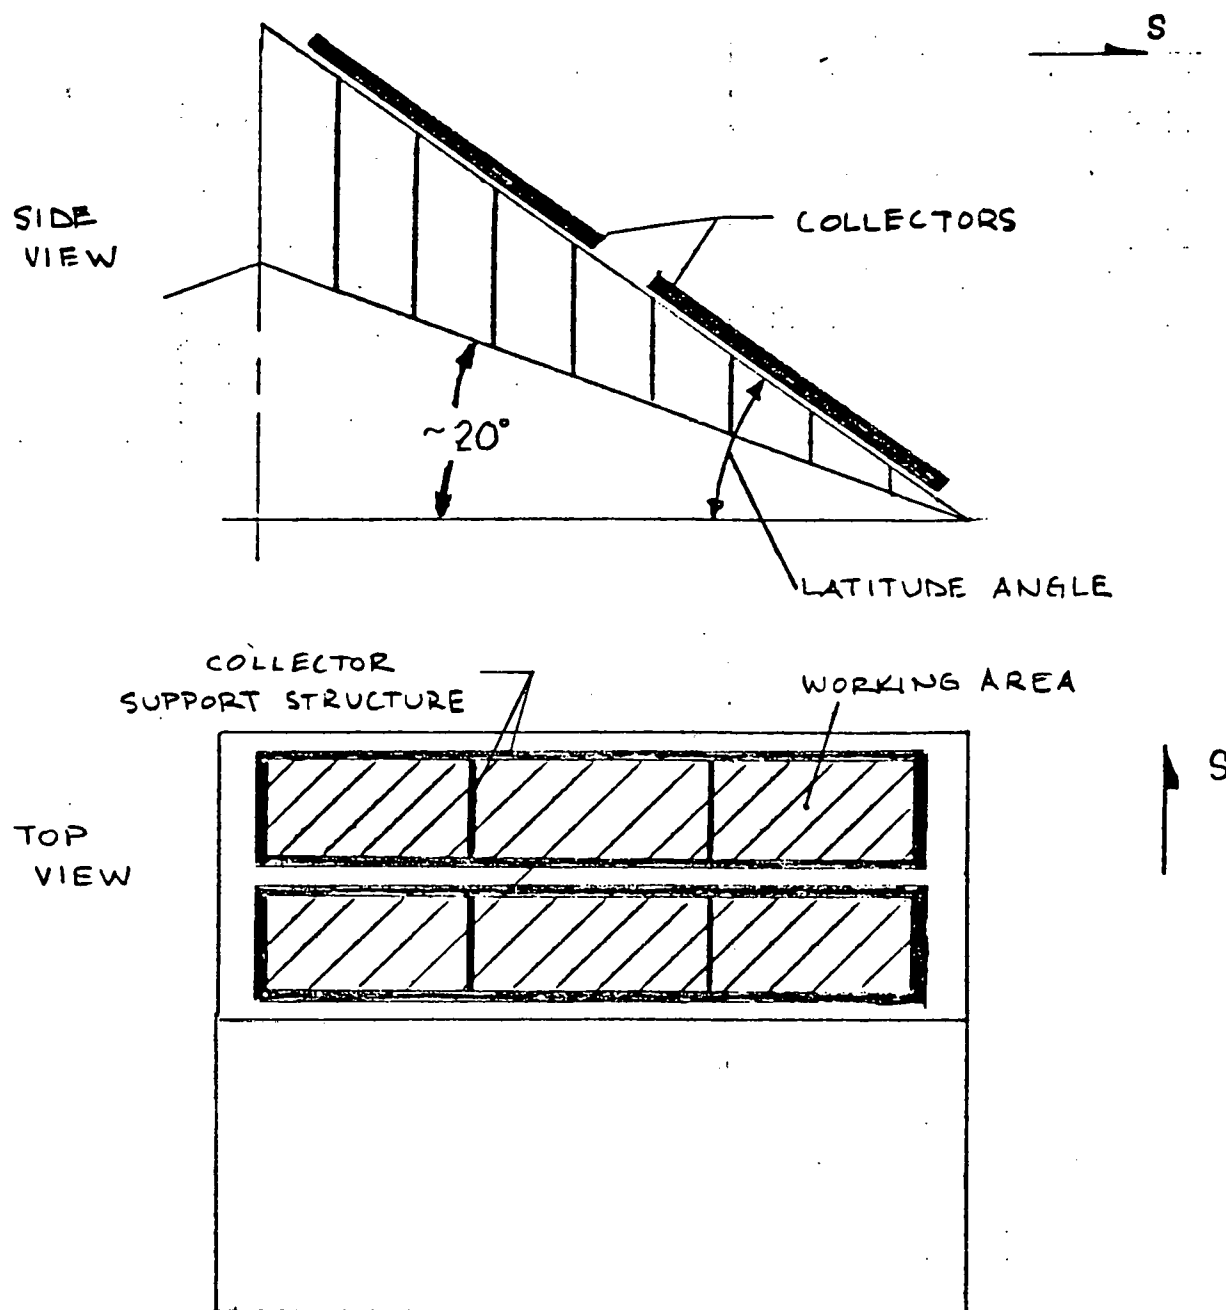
NON-TRACKING COLLECTOR MOUNTED AT LATITUDE ANGLE ON NEW OR PSEUDO ROOF
